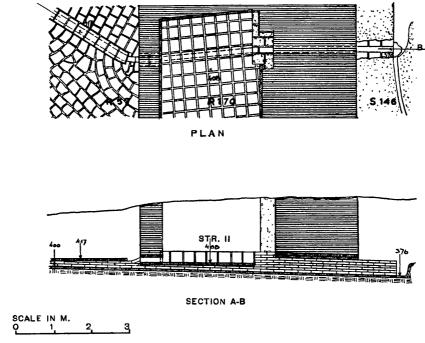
R57, R170, S146, brick pavements, drain, and toilet.
